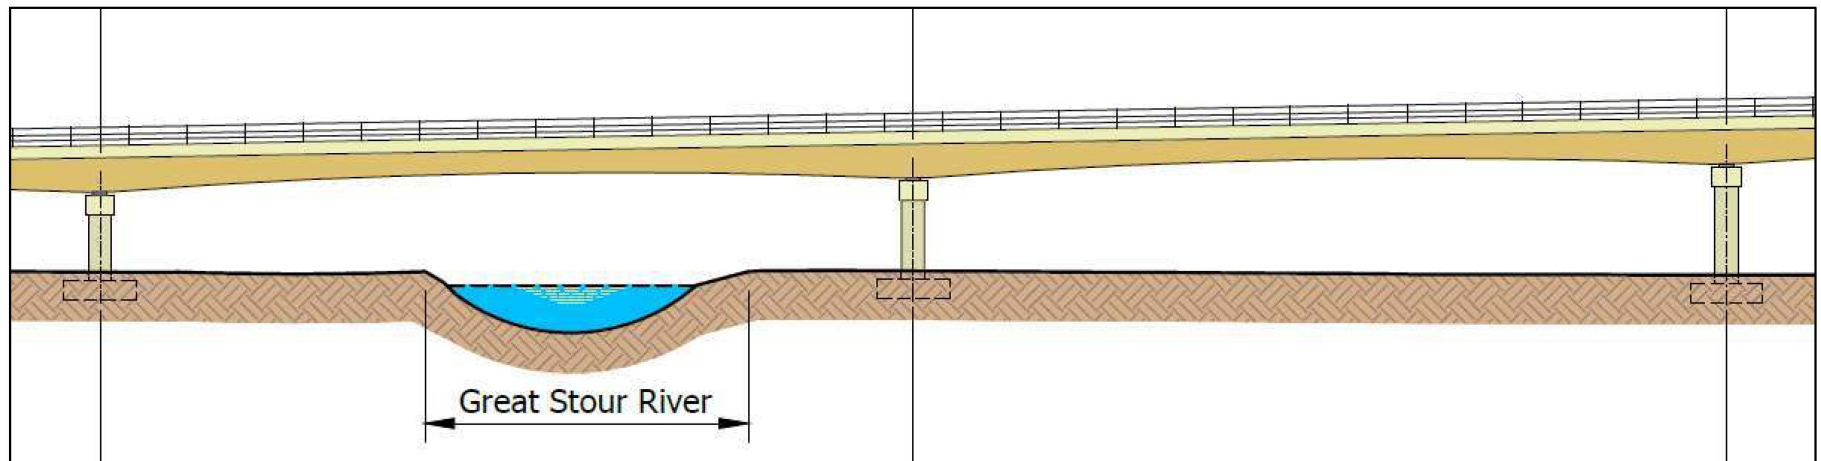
Side elevation of viaduct over southern branch of Great Stour River
